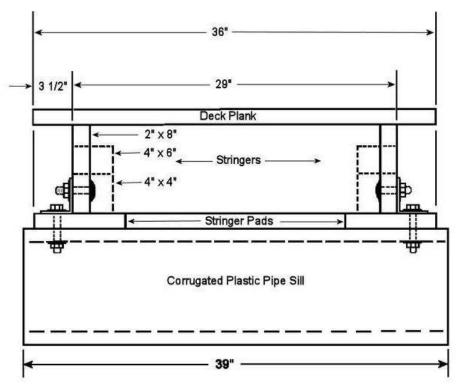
Corrugated Plastic Pipe Sill Assembly Detail
